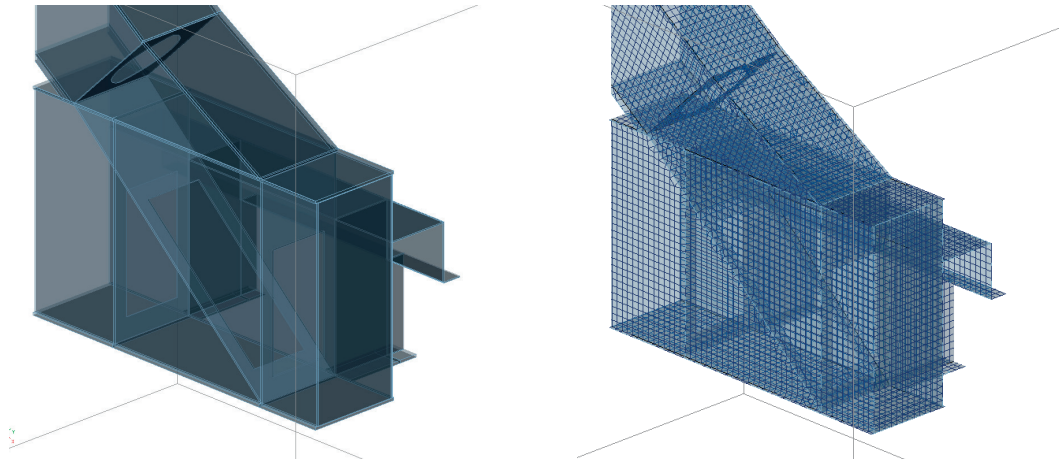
Detailed view on arch-to-girder connection of the bridge E in shell model alternative
